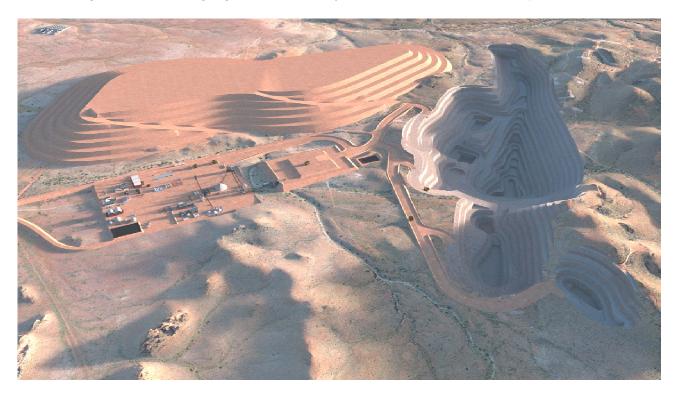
Altura Pilgangoora Lithium Pit Layout
